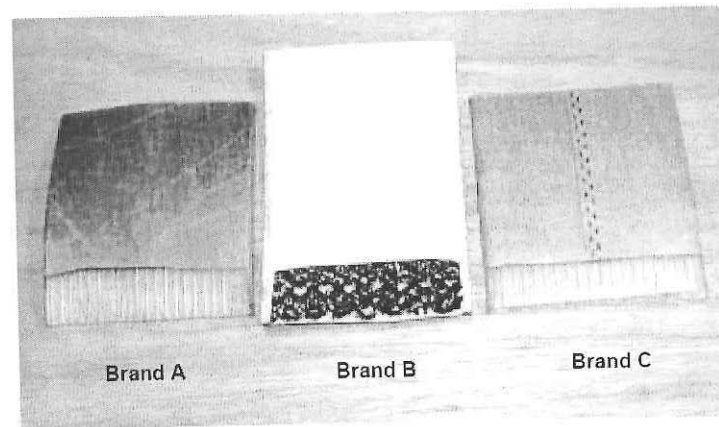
A typical Geotextile wrapped Prefabricated Vertical Drain.[5]
